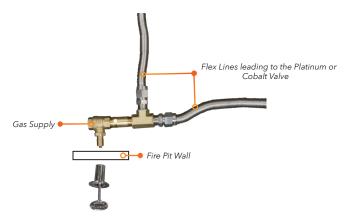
Connecting the Flex Lines from the Platinum or Cobalt Valve to the Key Valve
